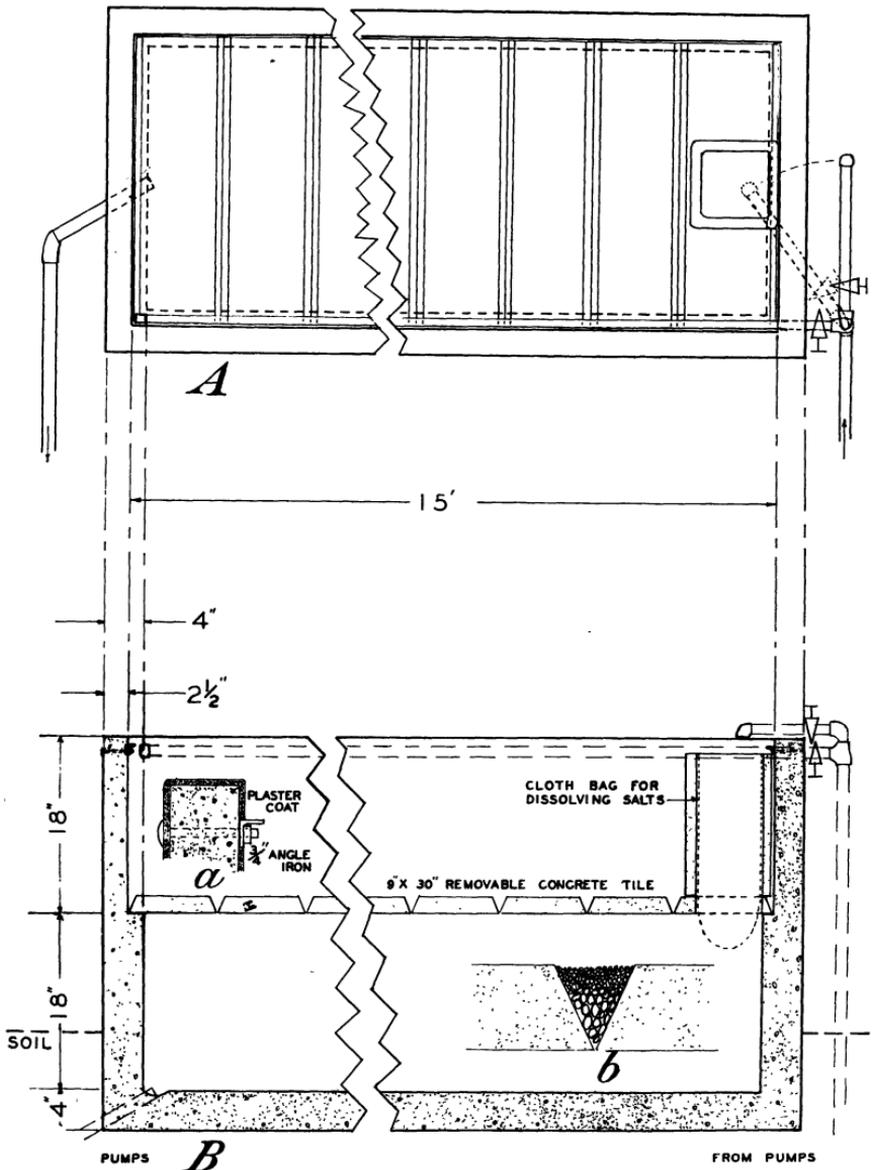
Sections of shallow concrete sand beds to be used for annual crops: A, Horizontal section; B, vertical section. a, Reinforcing angle iron (welded at four corners), which supports perforated metal plates above sand, to suppress evaporation and the growth of algae; b, a section at edges of two cross tiles, showing the sand-and-gravel drainage way.
